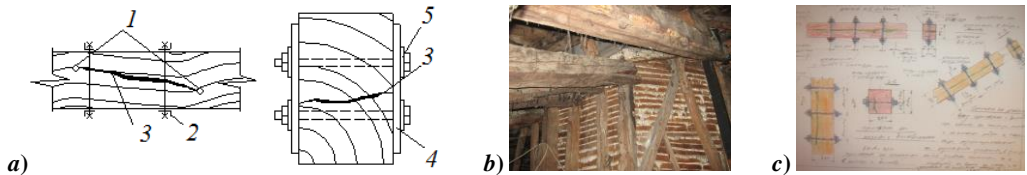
,b,c. Local strengthening of beams: longitudinal cracks [3]:
